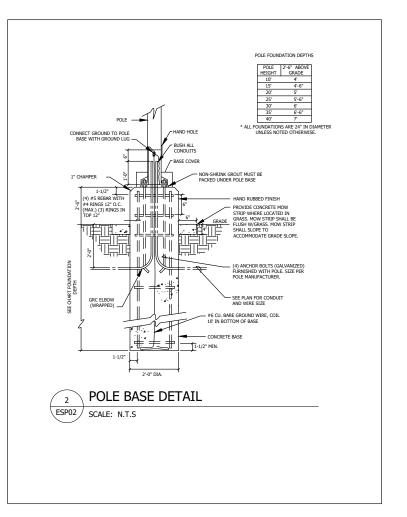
PHOTOMETRIC PLAN AND DETAILS/CUT SHEETS. 11.15.2019
